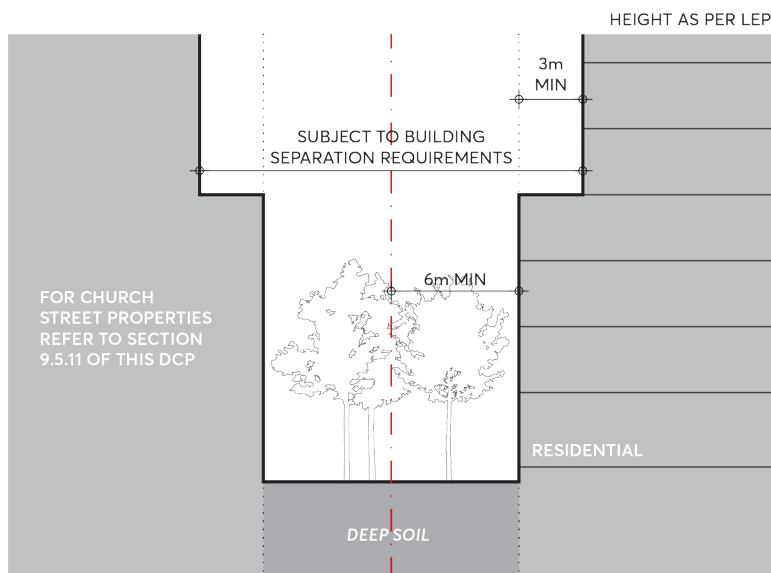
Setbacks and separation with properties fronting Church Street (site 05, site 06, site 09, and site 10)
